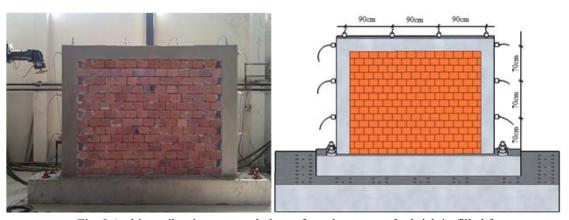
Ambient vibration tests and plans of accelerometers for brick in-filled frame
